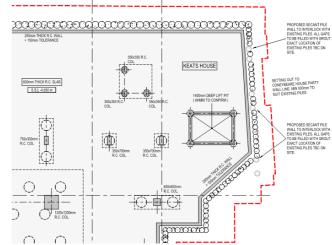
450mm Secant piled wall on the east side of Keats House; interlocking detail between existing piles and proposed secant piled wall
